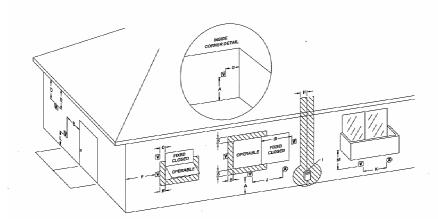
Minimum Clearances from Vent/Air Inlet Terminations - Indoor and Outdoor Installations
